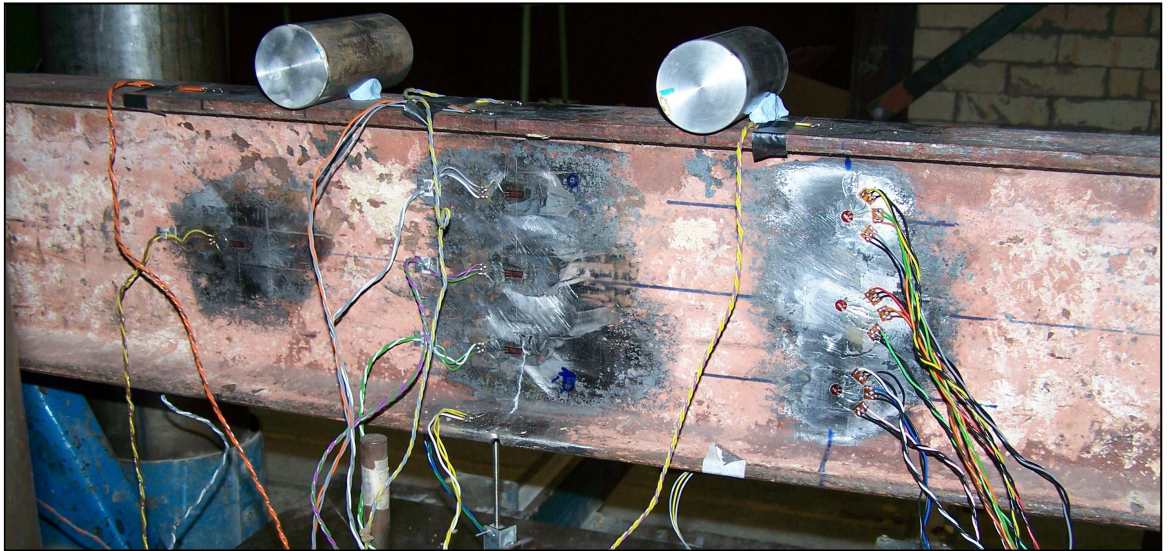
Back of beam with crack originating from notch in bottom flange at mid span. (Photo by M.O'Sullivan 2008)
